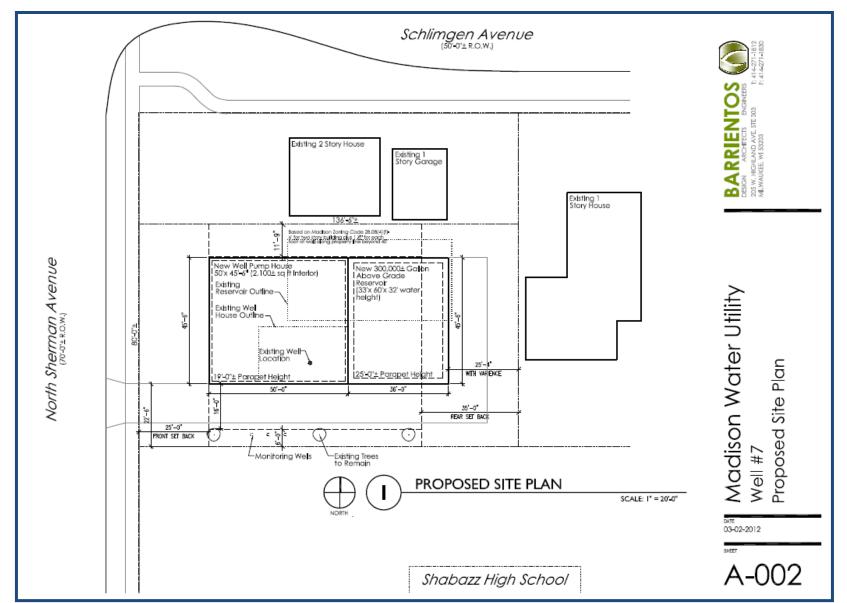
Proposed Site Plan Unit Well 7 within Existing Site
